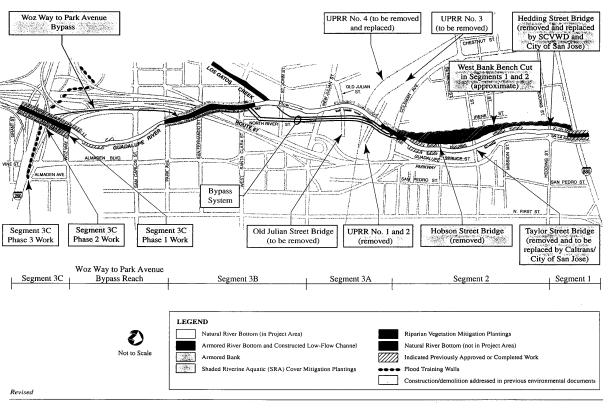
Guadalupe River Project with Refined Bypass System Alternative (Proposed Action)
